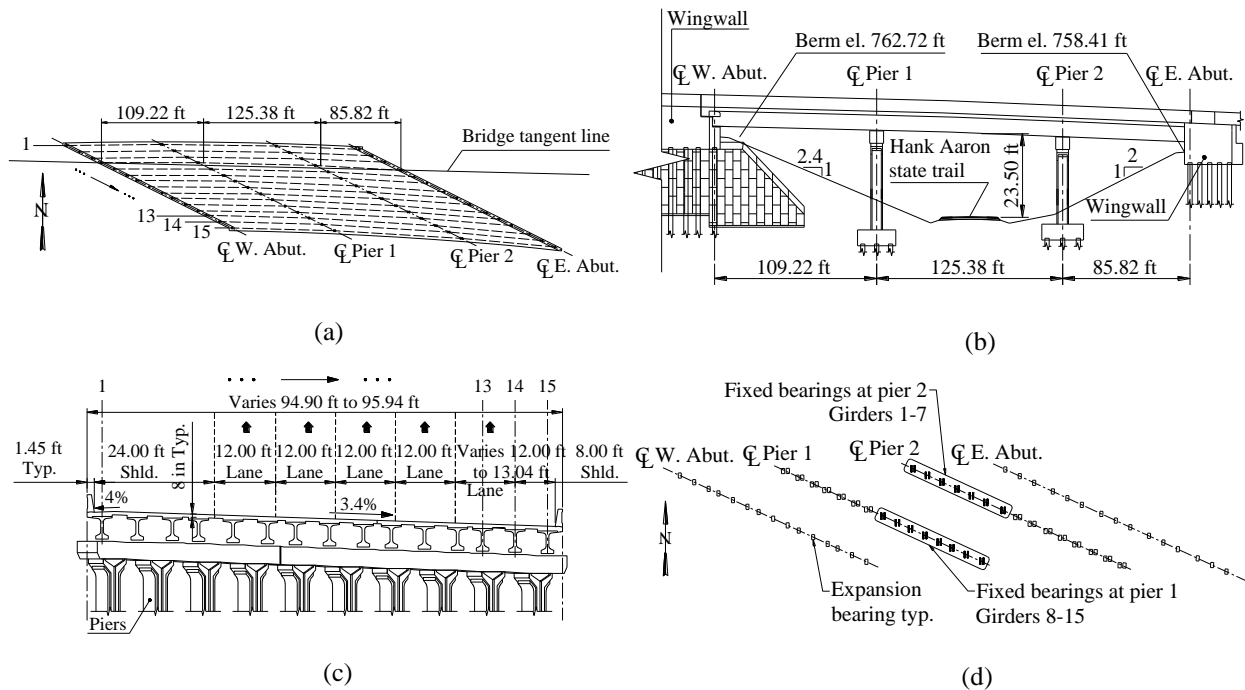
Bridge geometry: (a) plan view; (b) elevation (looking north); (c) cross section (looking east); (d) bearing layout shown on plan view [1 ft = 0.3048 m]
